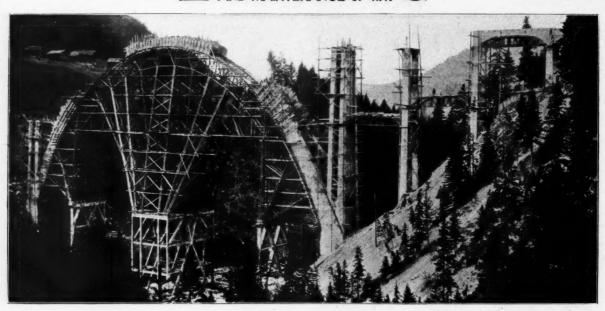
Details of Reinforced Concrete Tower and Timber Centering Under Arch Haunches.
